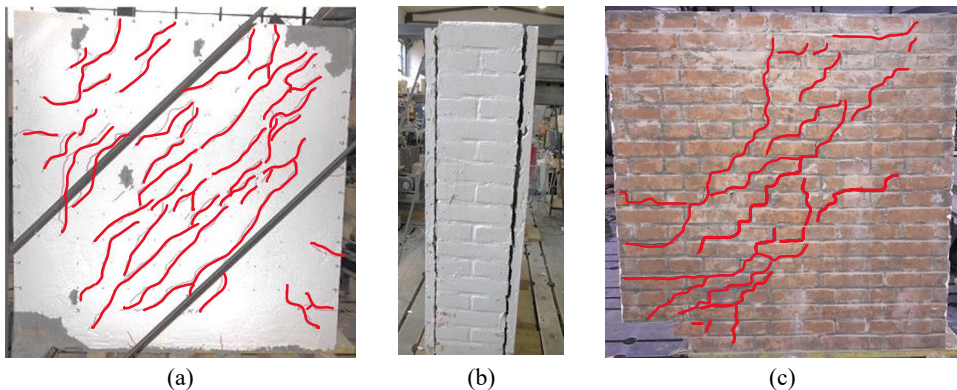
Damage pattern at the end of the test for cementitious plaster specimen MR2-3-8-C-1: (a) front, (b) side and (c) on masonry behind the plaster.
